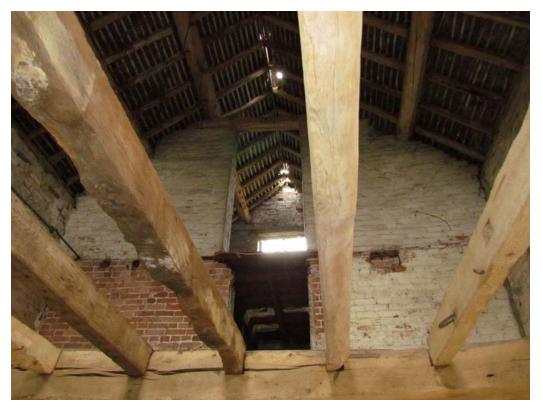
View of Internal Wall at Bin and Loft Floor Level, Looking South.
